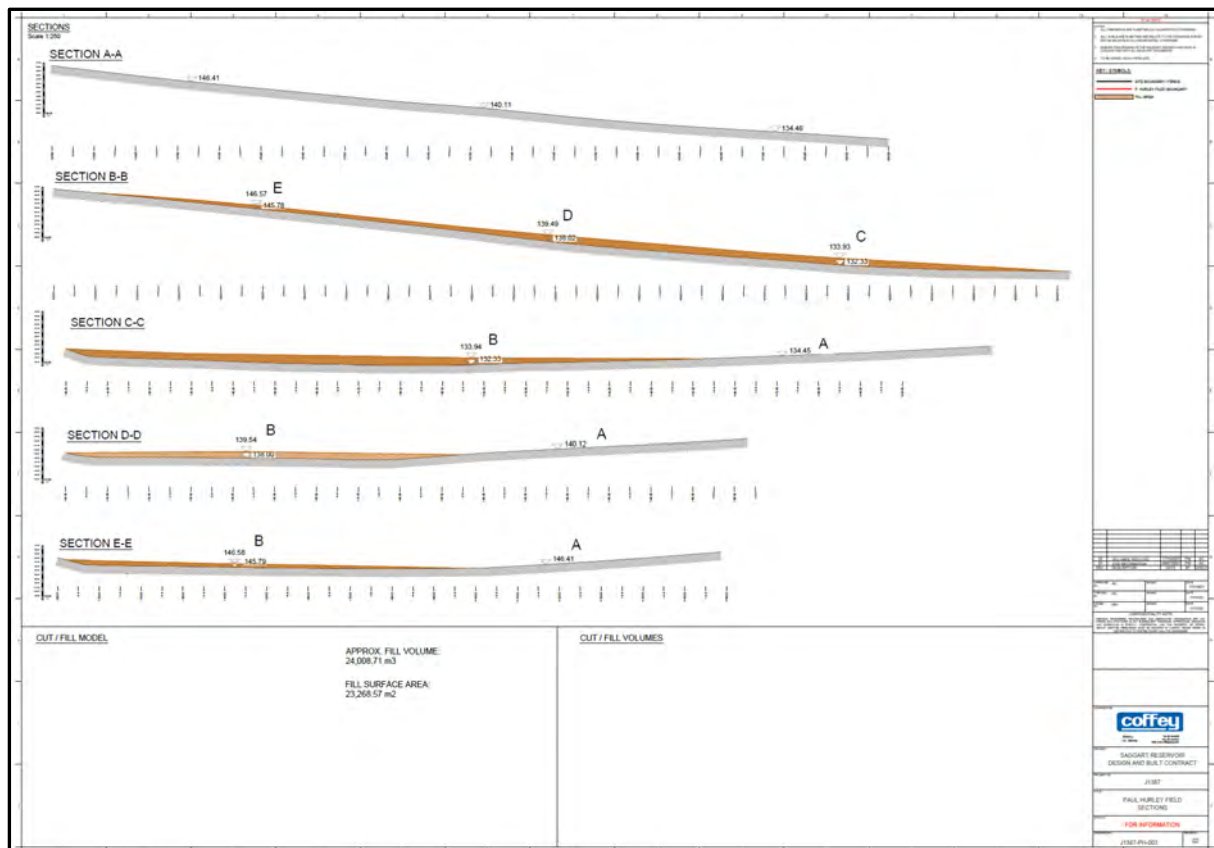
Extracts from cross sections of the site (Refer to Planning drawing J1387-PH-003)
